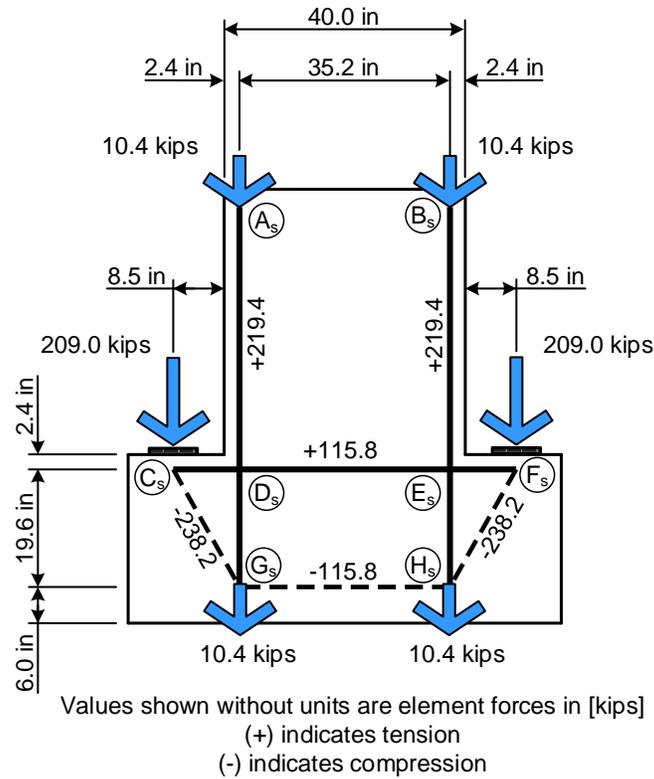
Local Strut-and-Tie Model at Beam Line 2
